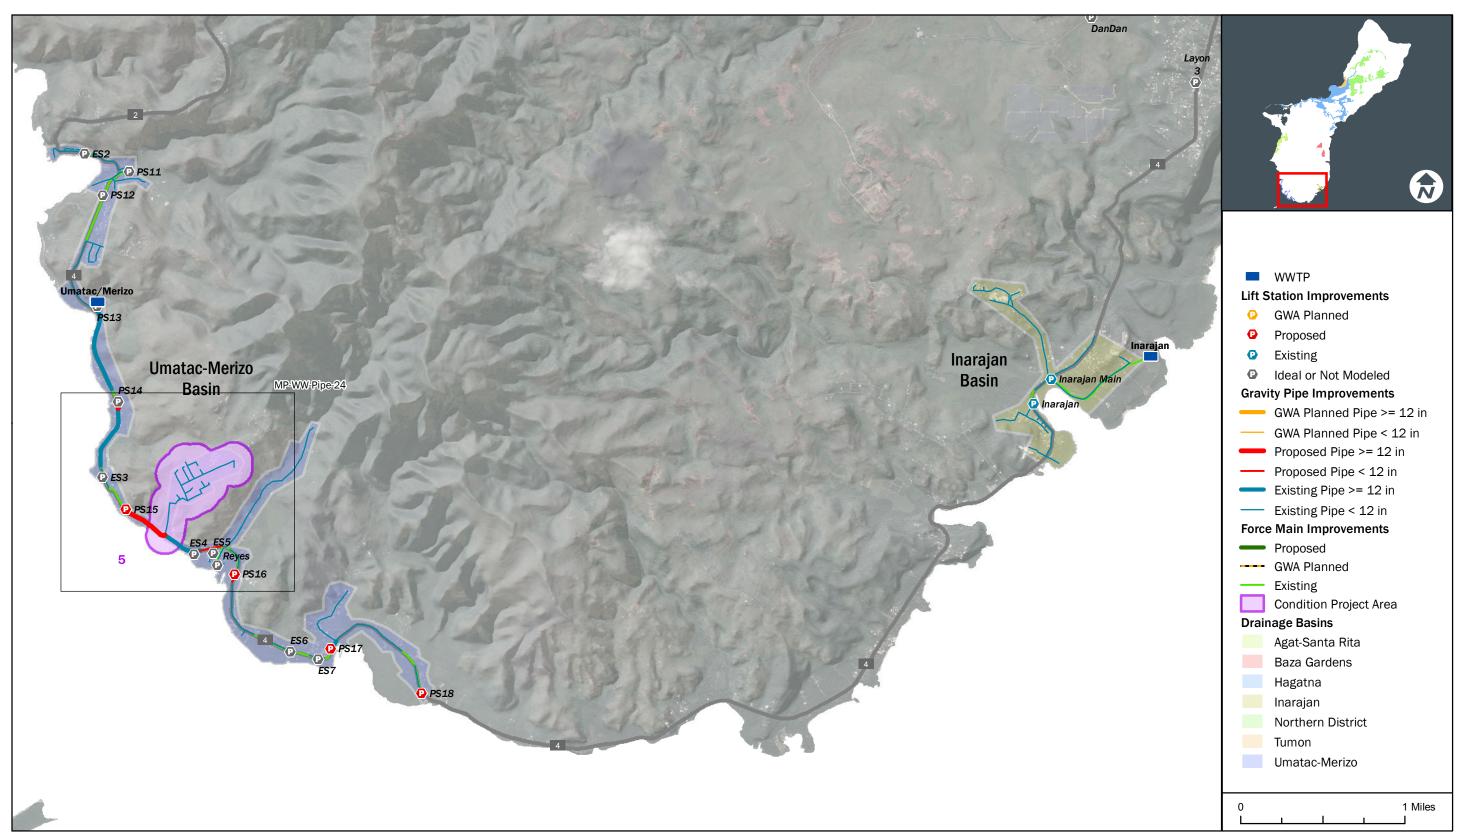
Umatac-Merizo and Inarajan Basins Piping and Lift Station Improvements
